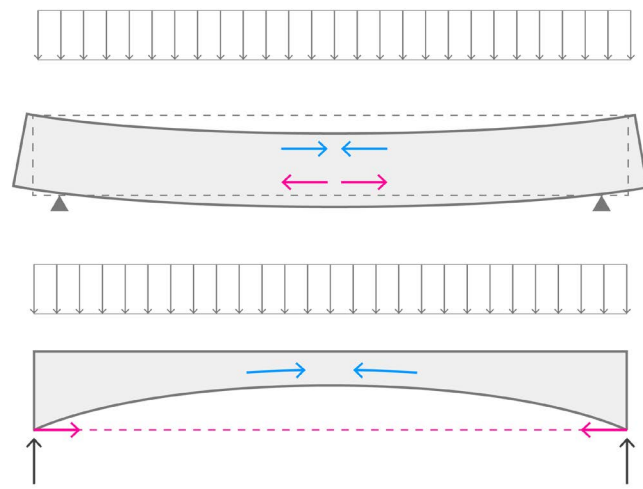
Comparison of solid concrete floor (left) to an arched concrete floor (right) under identical uniformly distributed loading. Adapted from Block et al., 2020.
